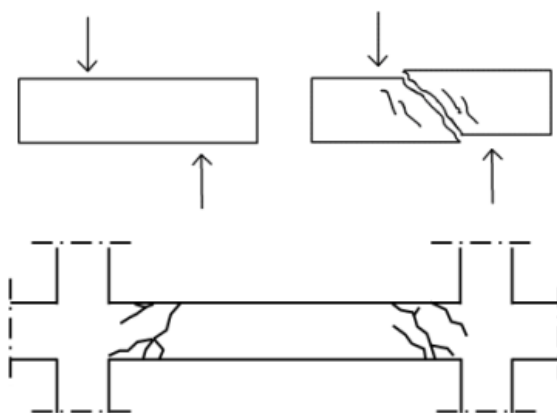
Shear cracks in a reinforced concrete member [58]
